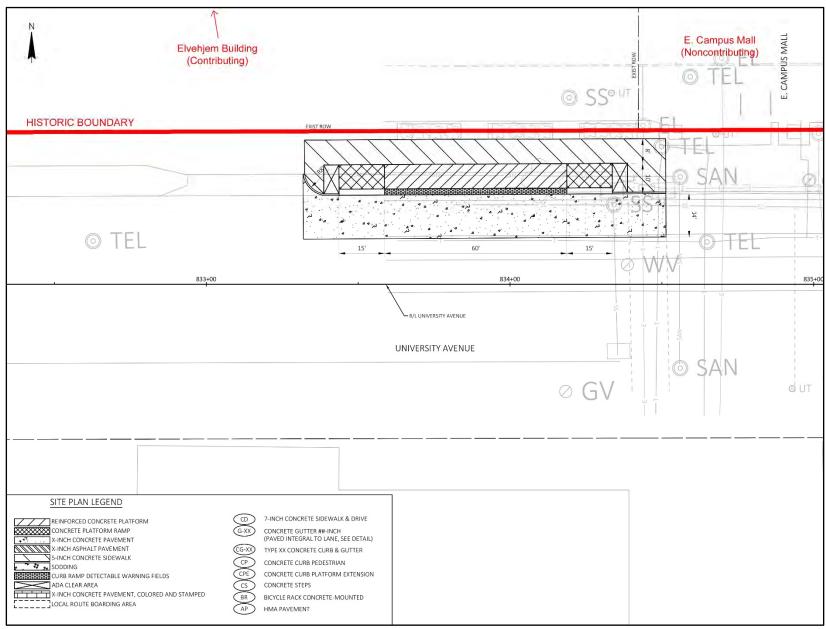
University Avenue at Campus Mall – Plan View of Proposed Farside Curbside Station Adjacent to Bascom Hill Historic District
